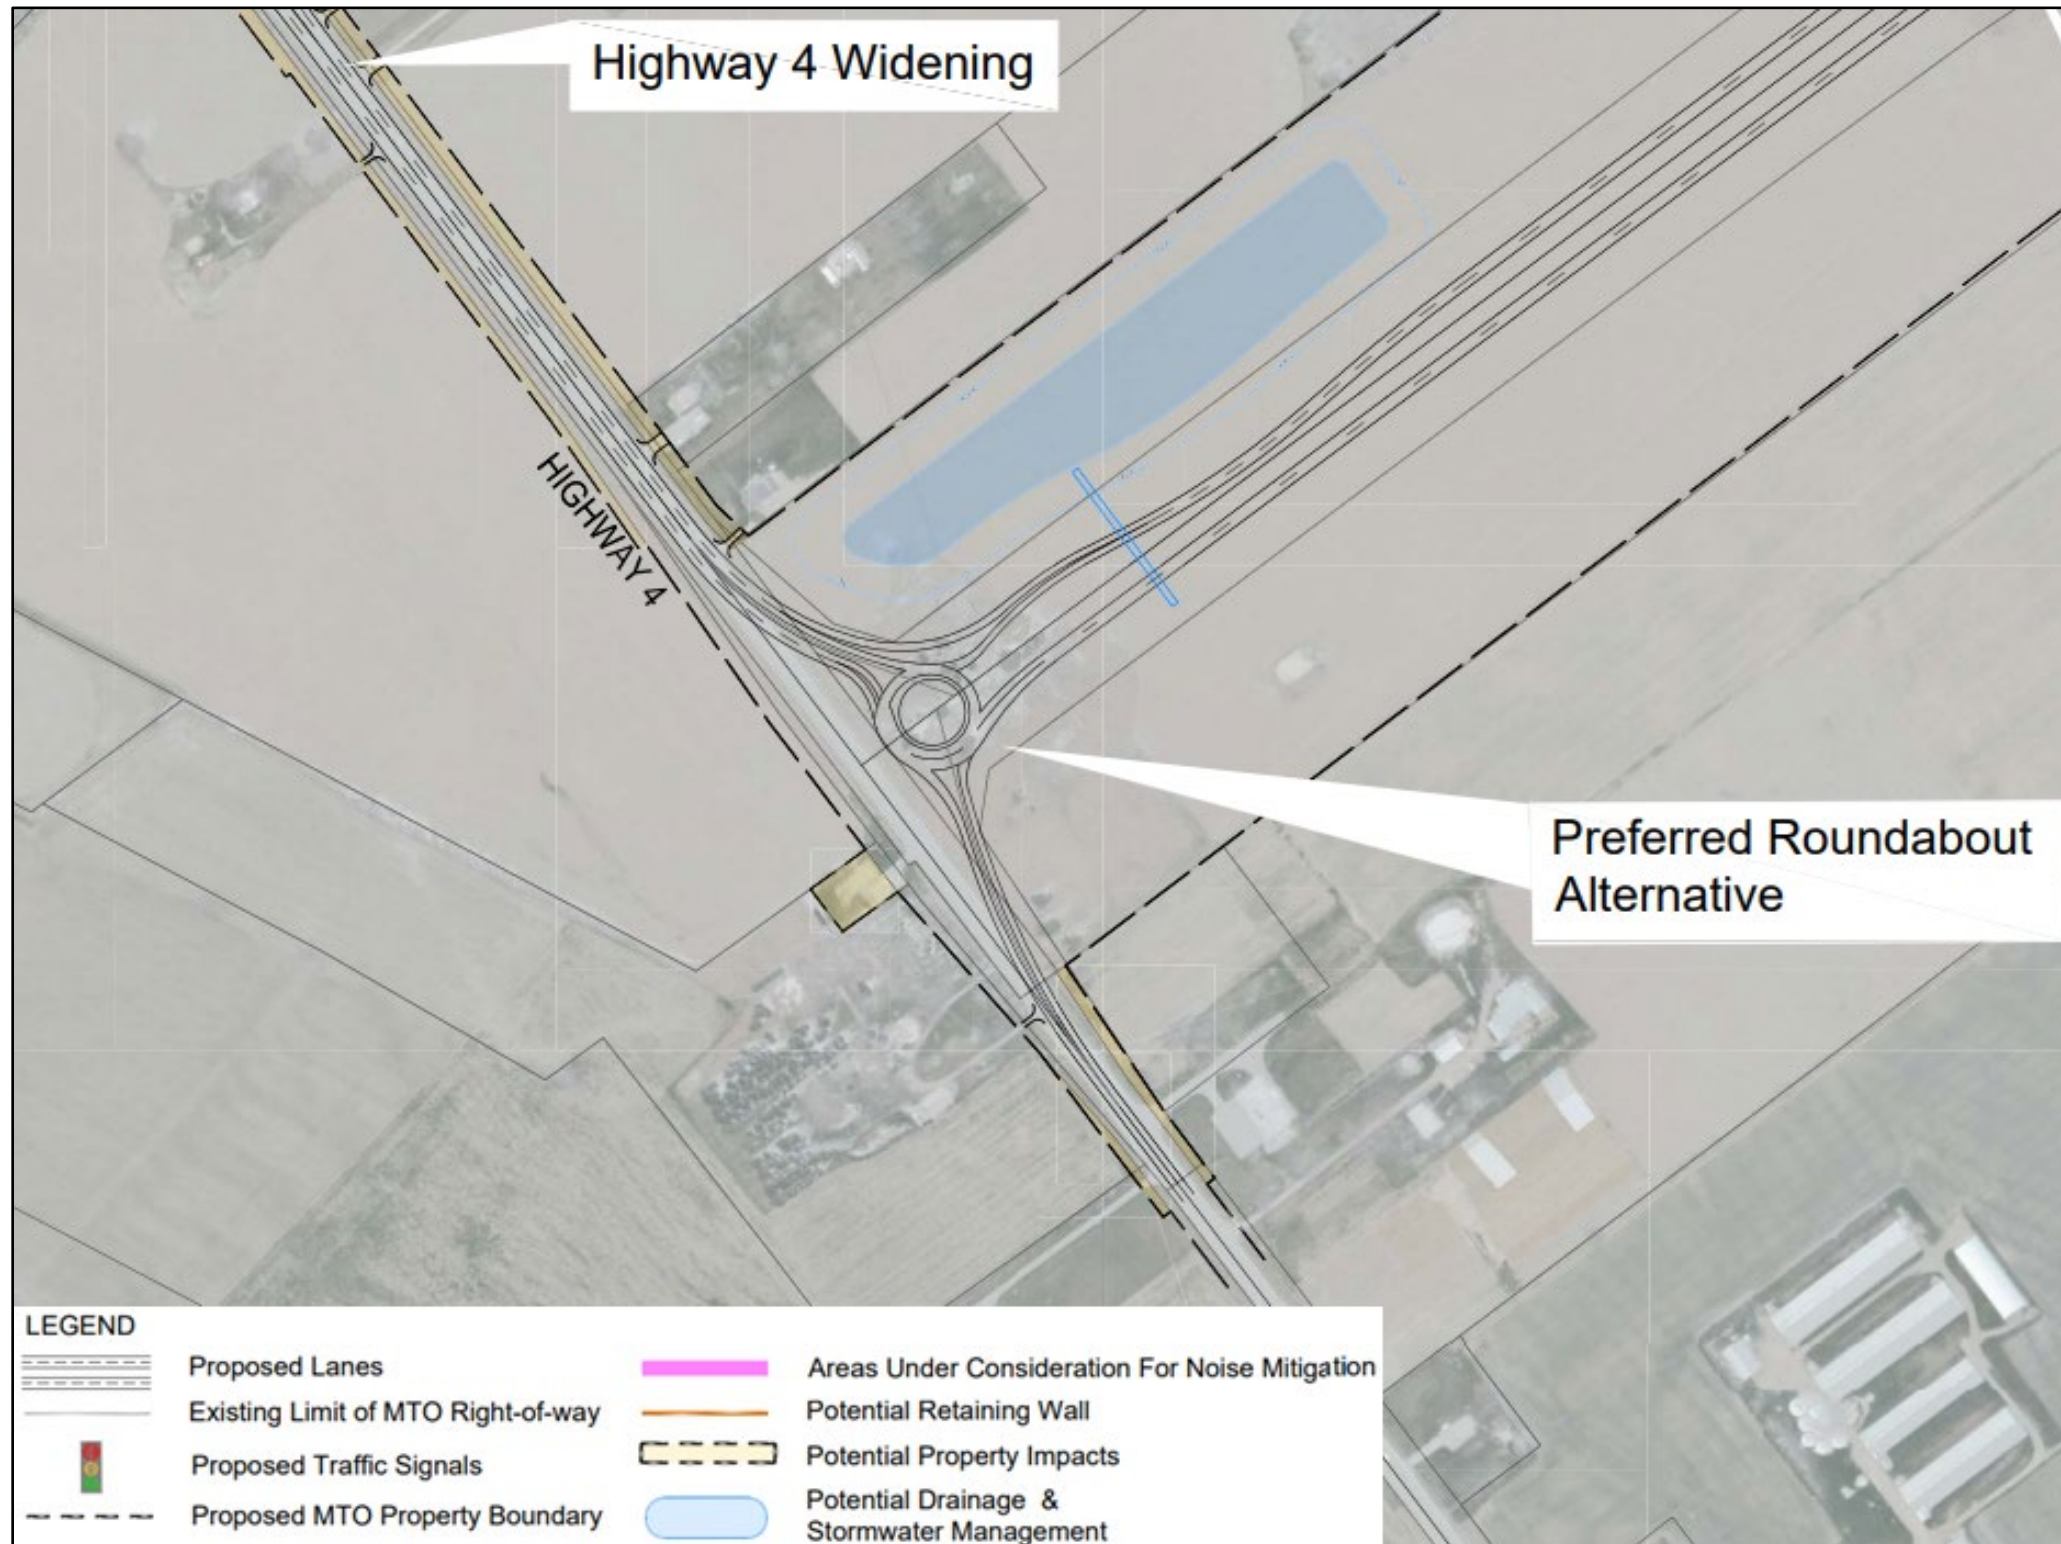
Recommended Plan at the Highway 4 Intersection with Talbotville Bypass
